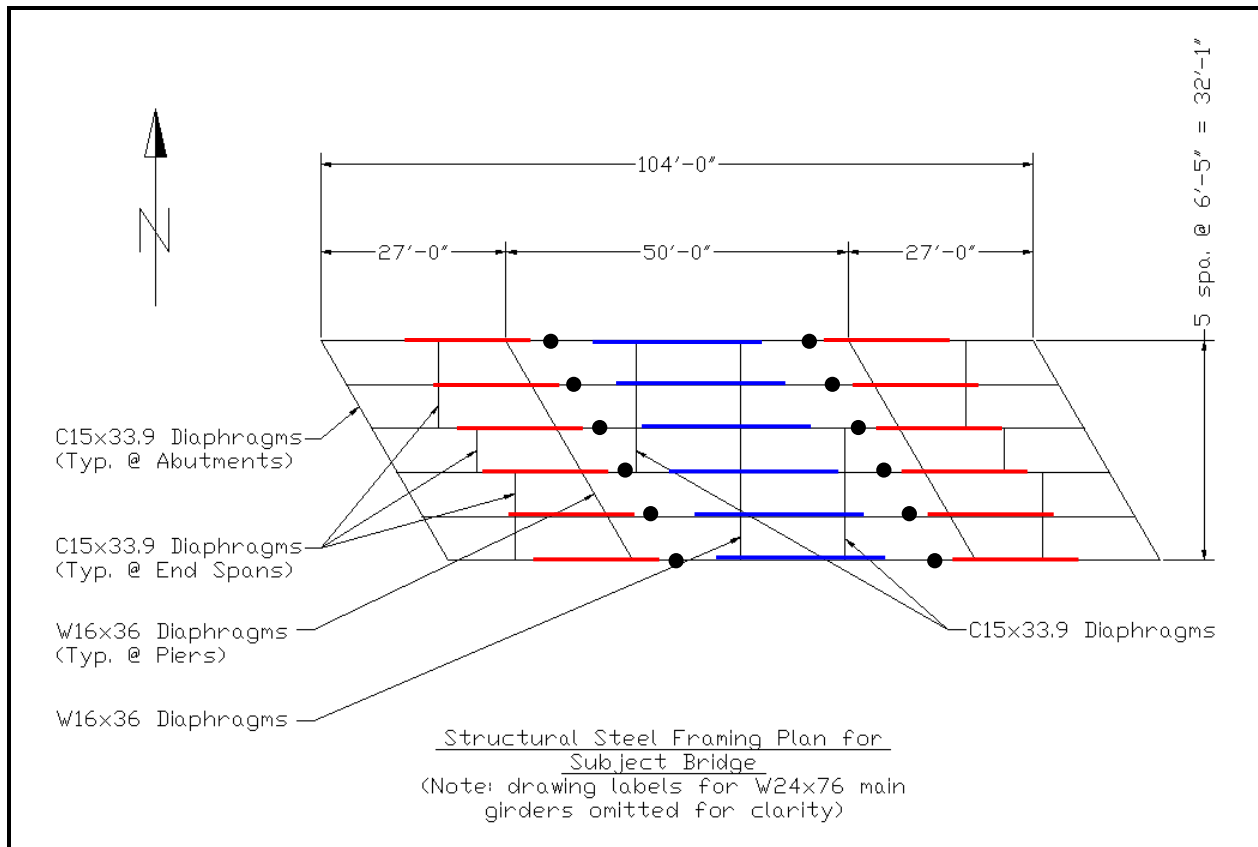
Plan view of steel framing plan for the subject bridge.
